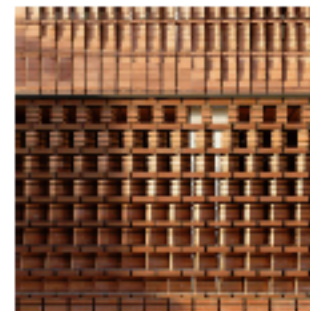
BRICK WALL, ARCHITECTURAL DRAWING AND CONSTRUCTION DRAW
